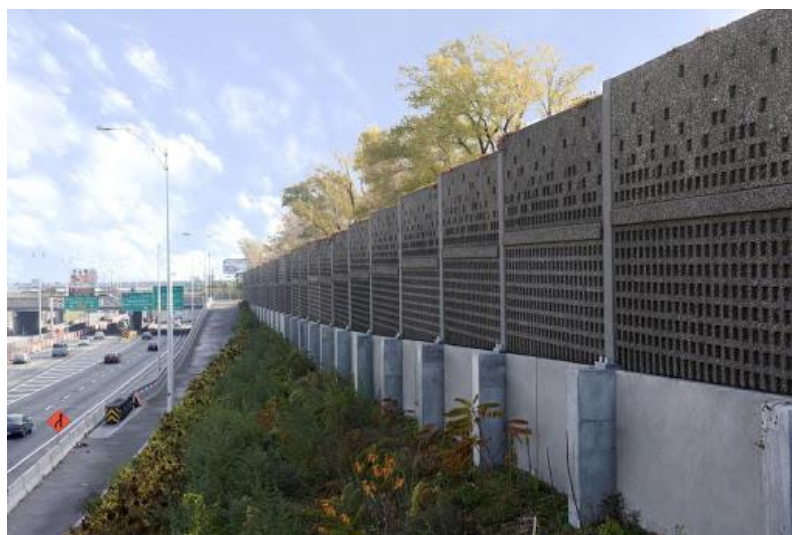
Precast Rubber Concrete Road Barrier (Whisper, 2015).
